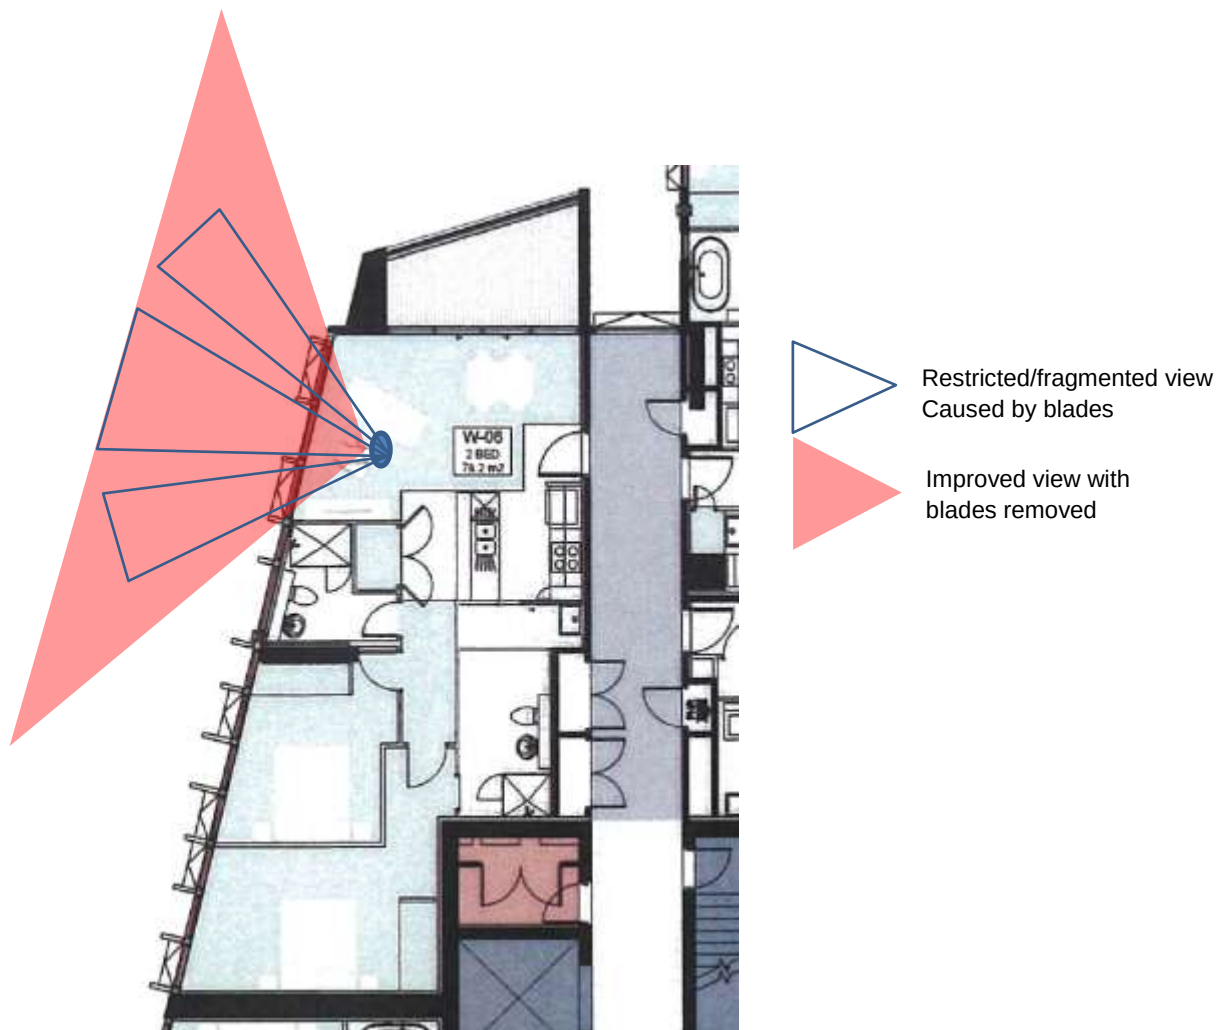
Extract from approved west tower level 28-30, showing the extent to which the louvres/blades restrict views
